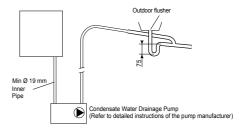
Typical Connection Method of a Condensate Water Drainage Pipe (refer to detailed instructions of the pump manufacturer)
